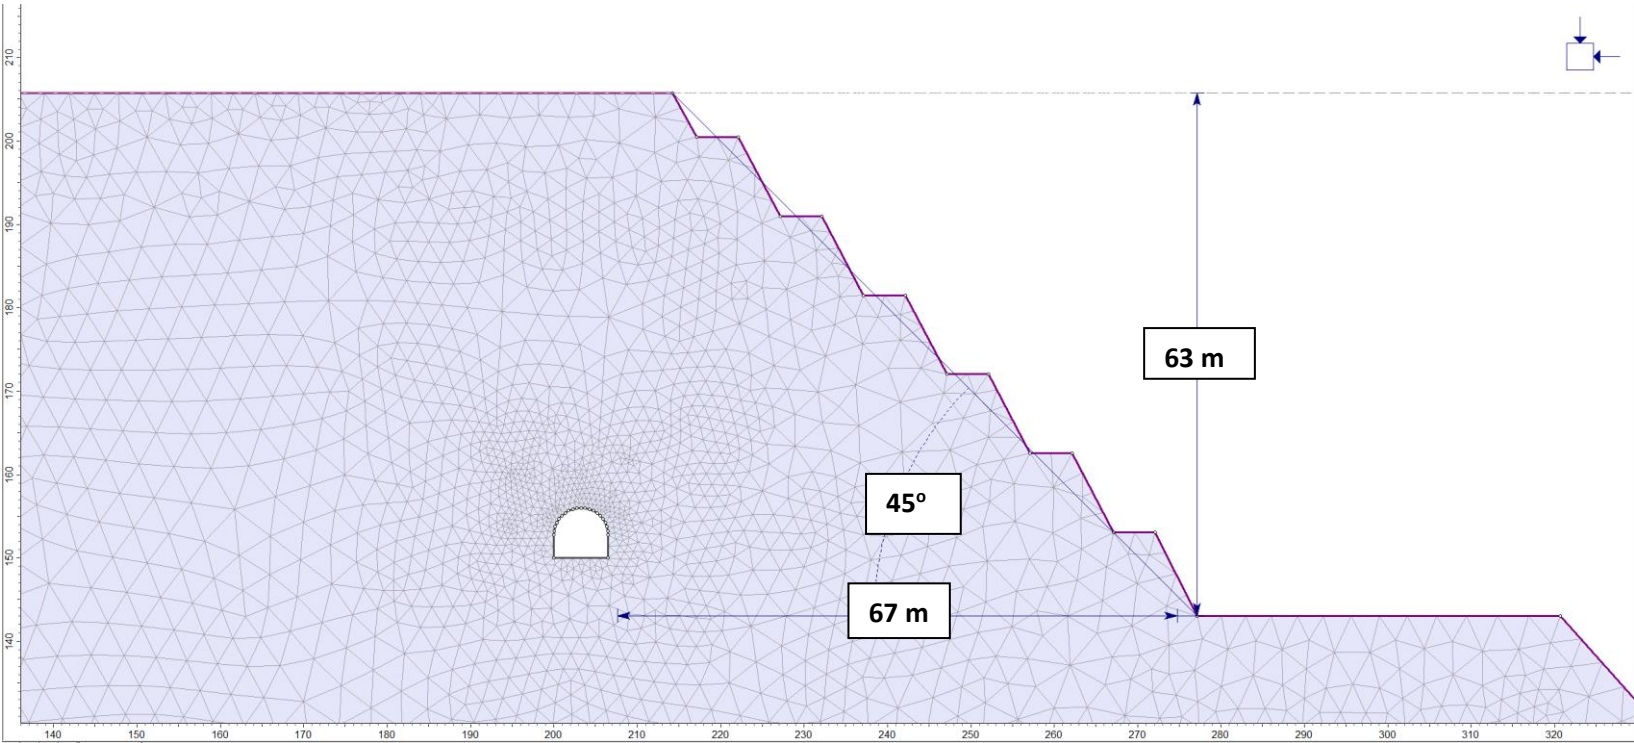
Slope dimensions and finite element model of the planned slope profile, section A-A', Km 26+650
